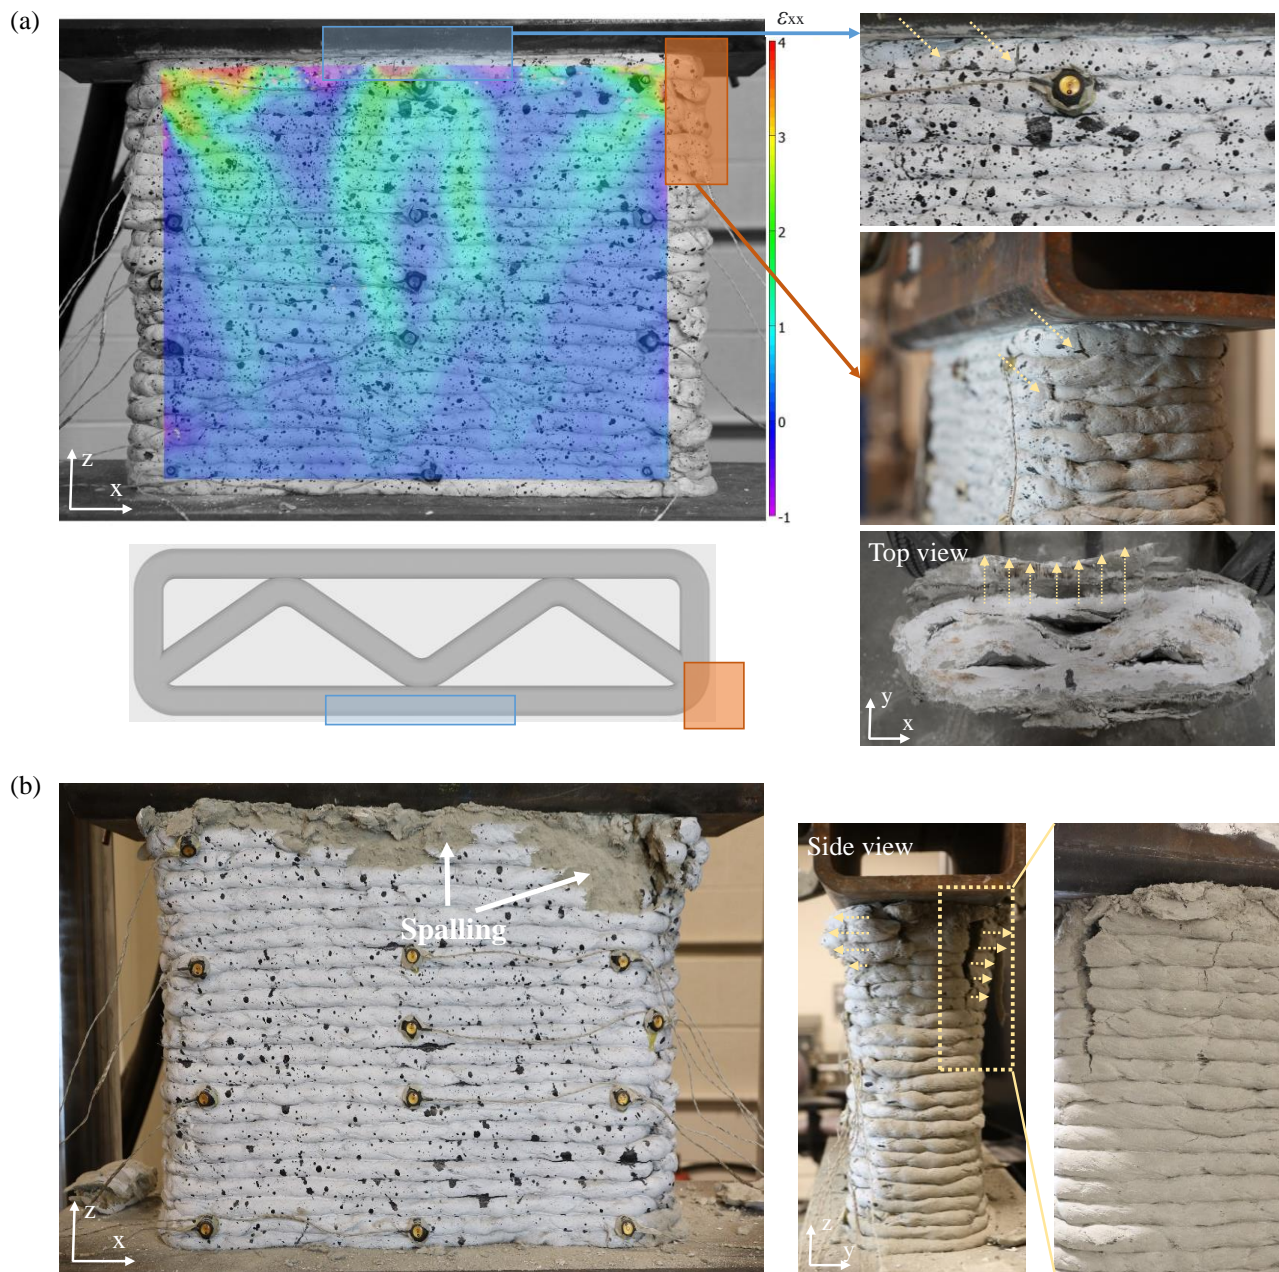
(a) Horizontal strain field and crack pattern and (b) failure mode of TrussA wall under compression.
